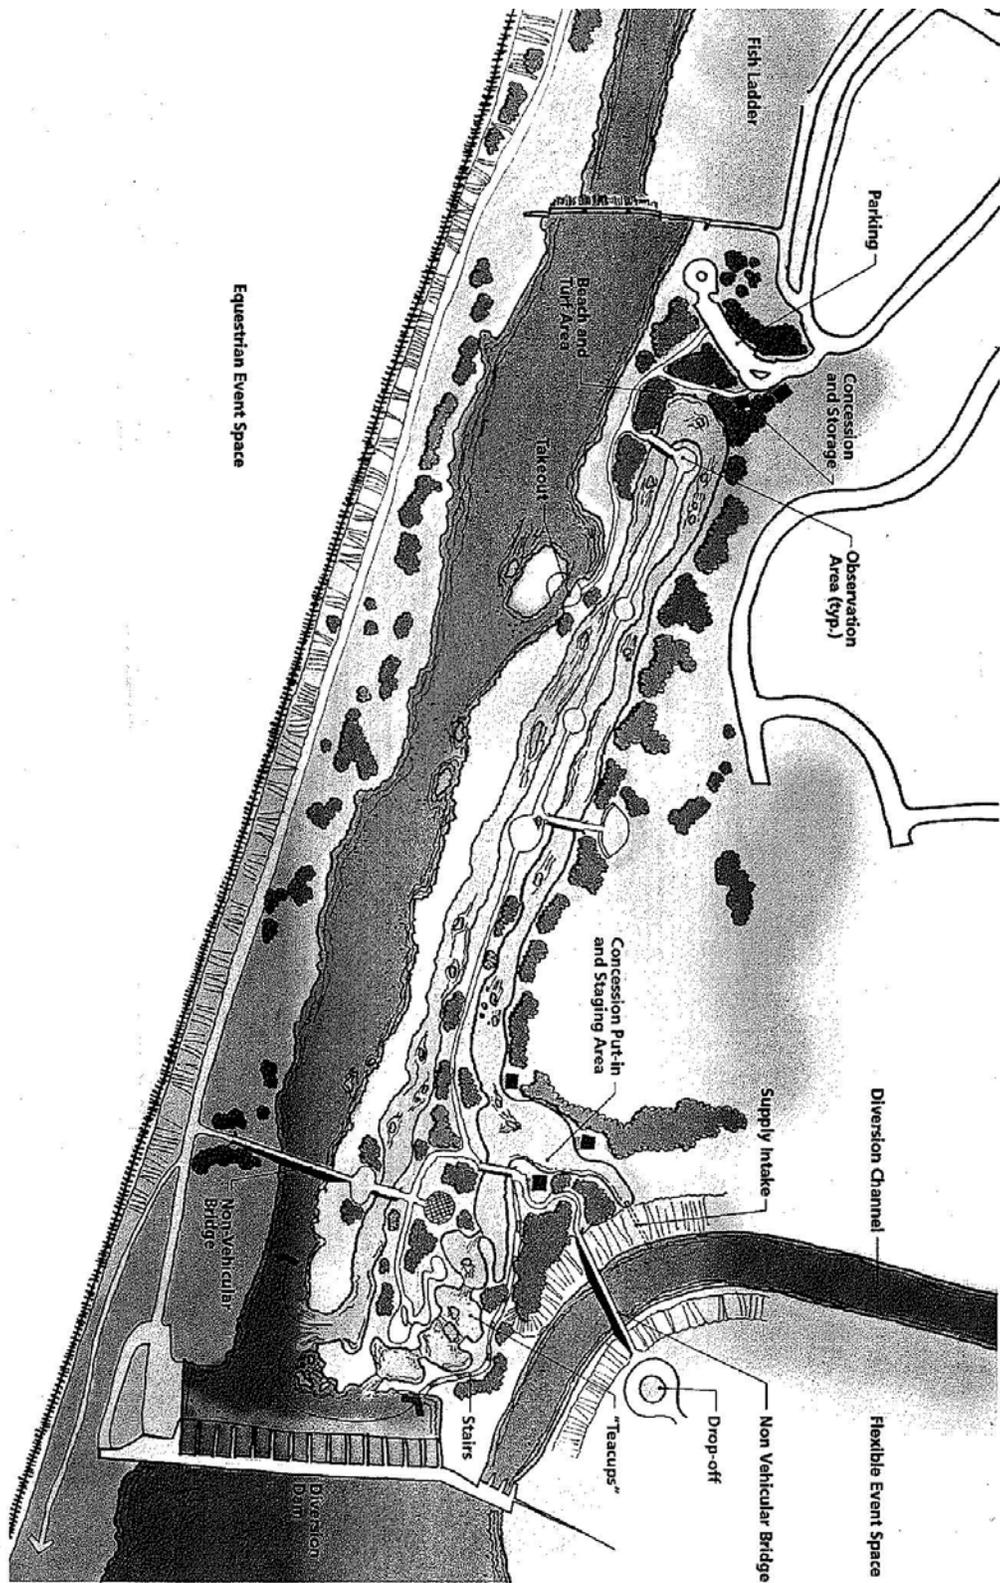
Conceptual whitewater park design for the Fish Barrier Pool site submitted with the City of Oroville's PM&E form (2003).
